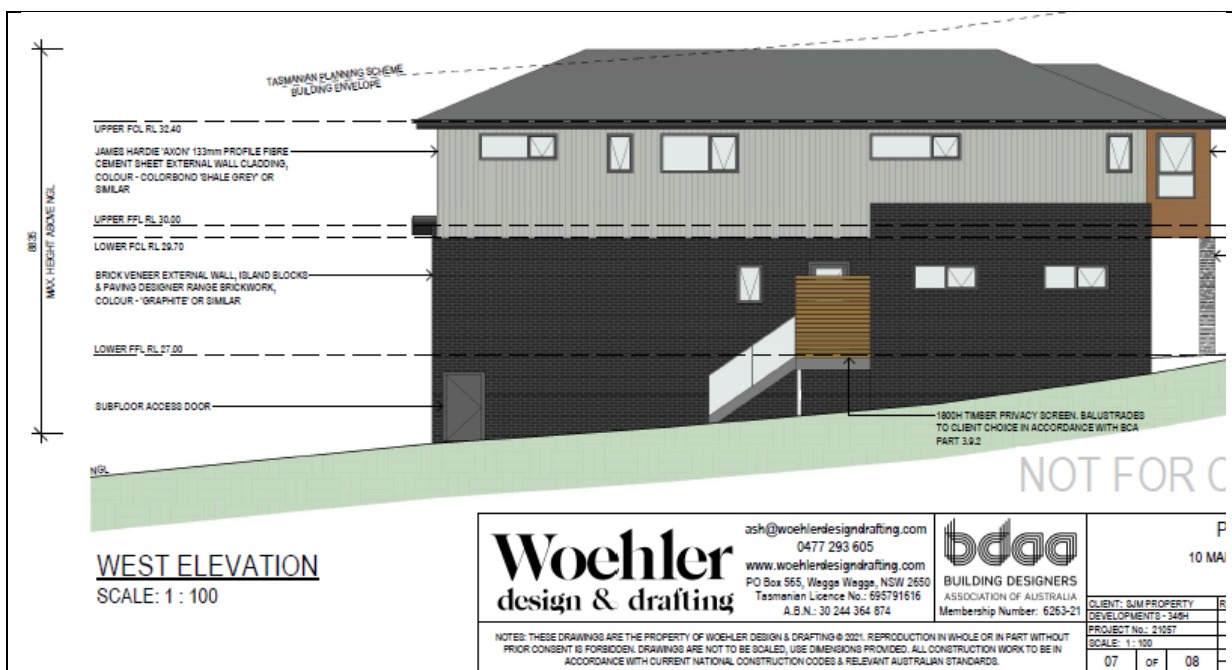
Advertised Plans (Approx. building height of 8.8m)
